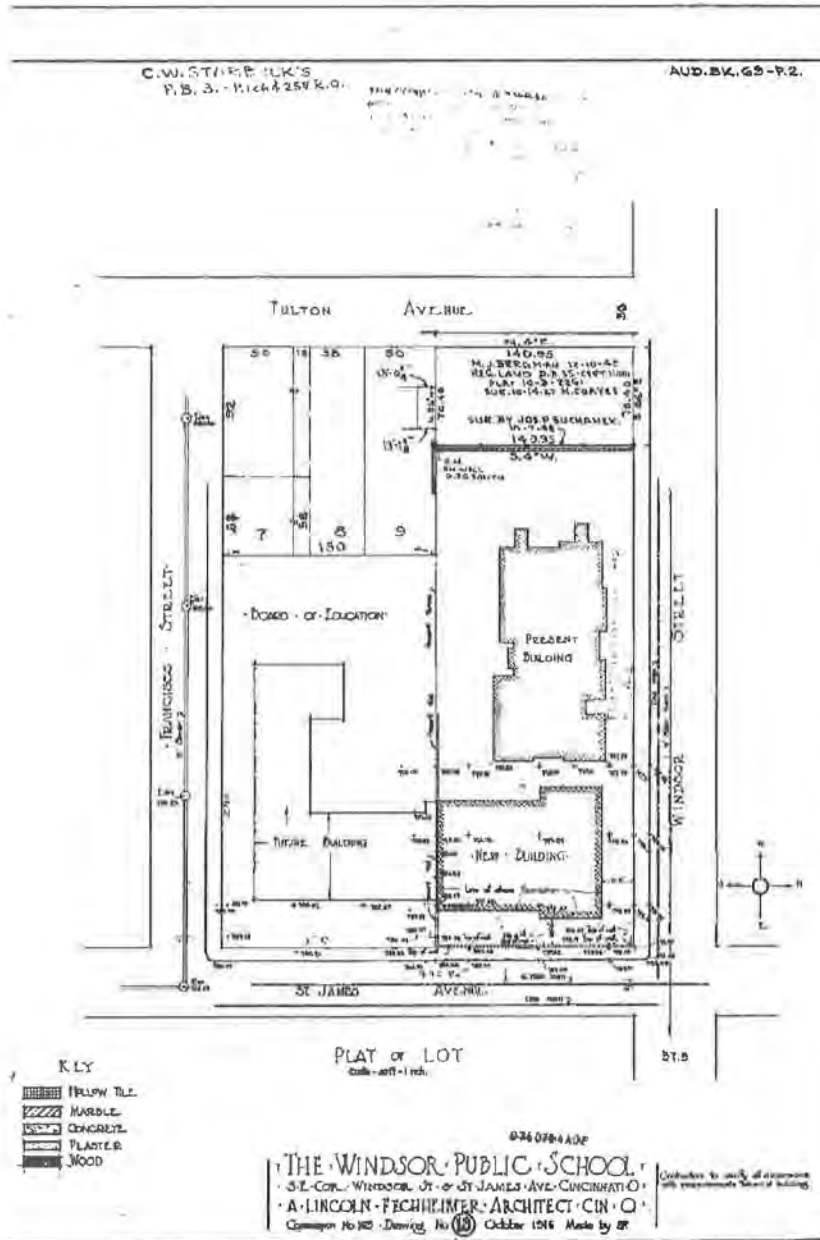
Original Site Plan, Main Building, Annex, Proposed School
